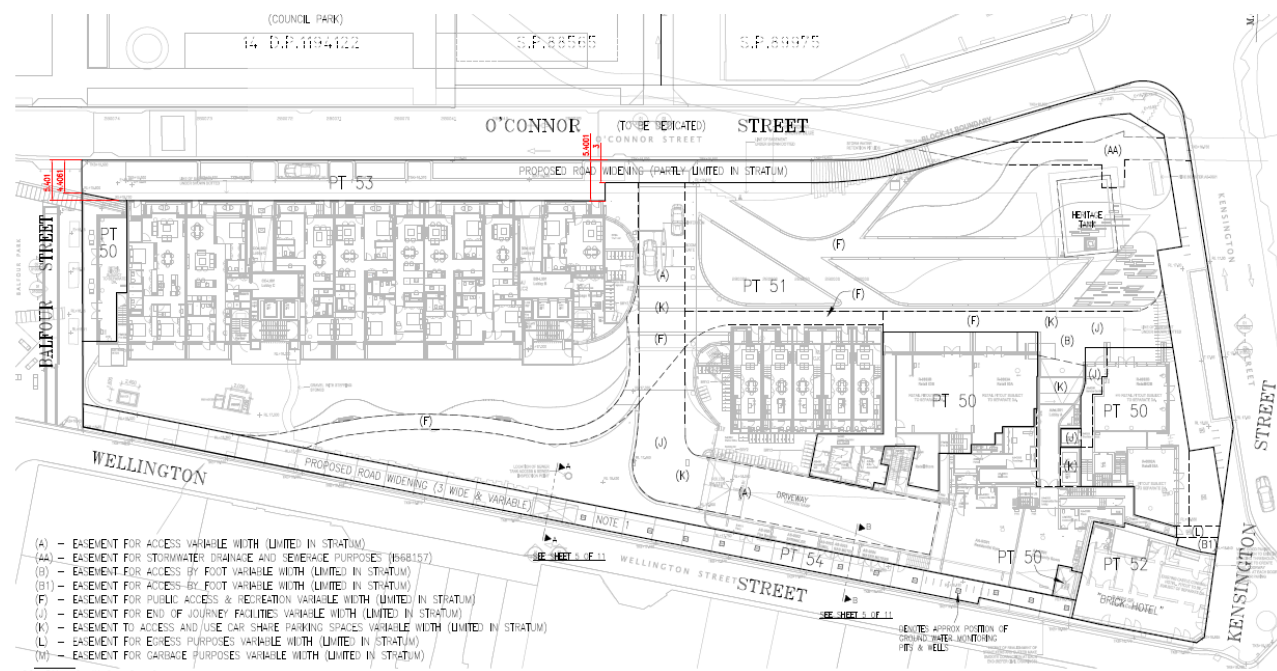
The proposed schedule of stratum lots on the ground floor overlaid with the approved development (SSD 6376).
